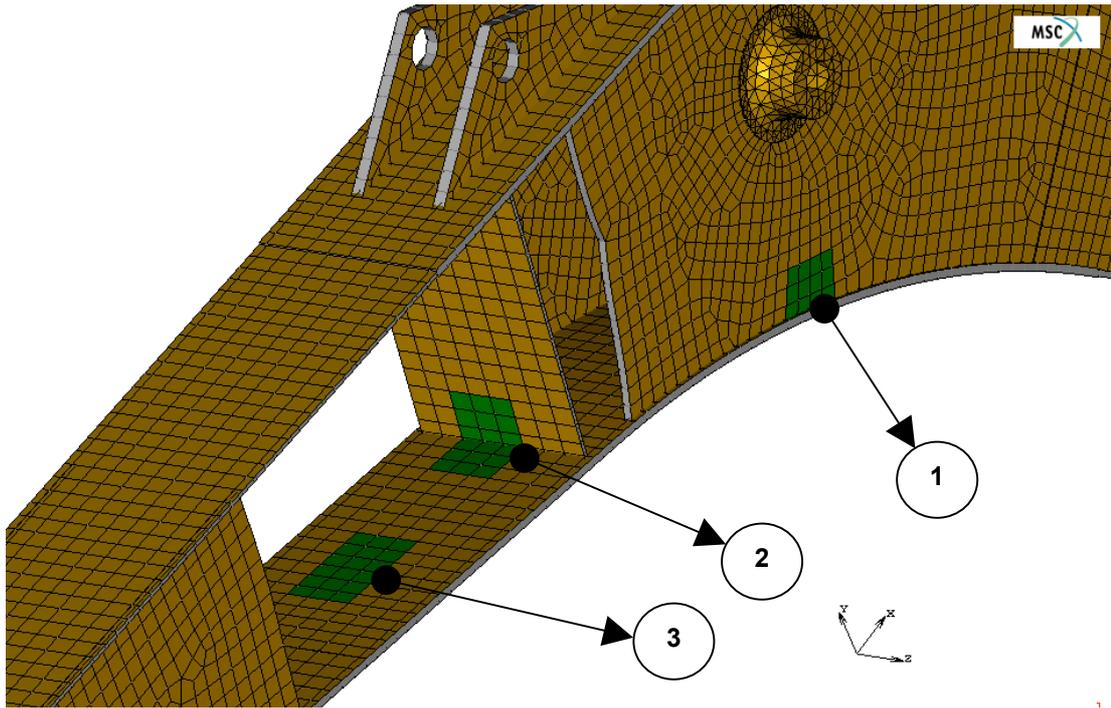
Representation of three typical weld joint on the boom structure.
